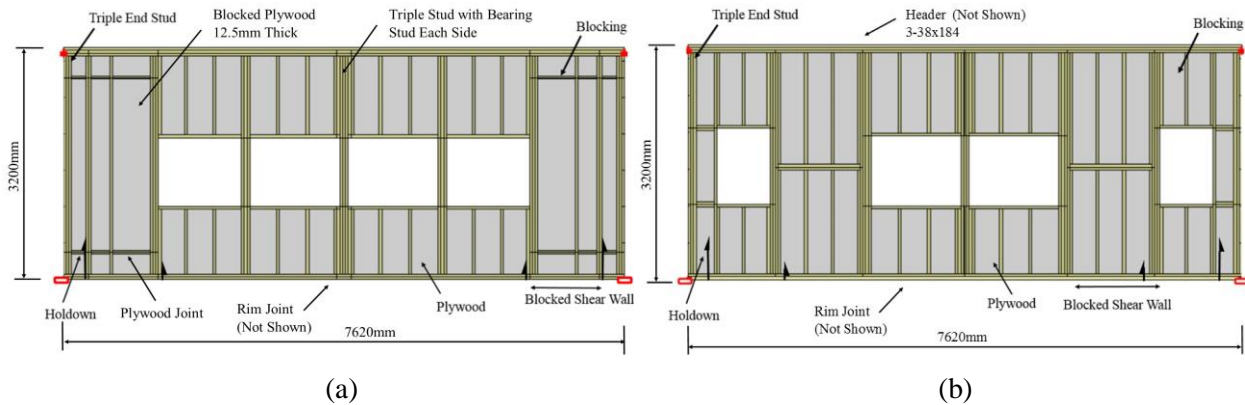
Exterior wall framing and configuration, north and south view: a) Pattern “A”, b) Pattern “B” [1]
